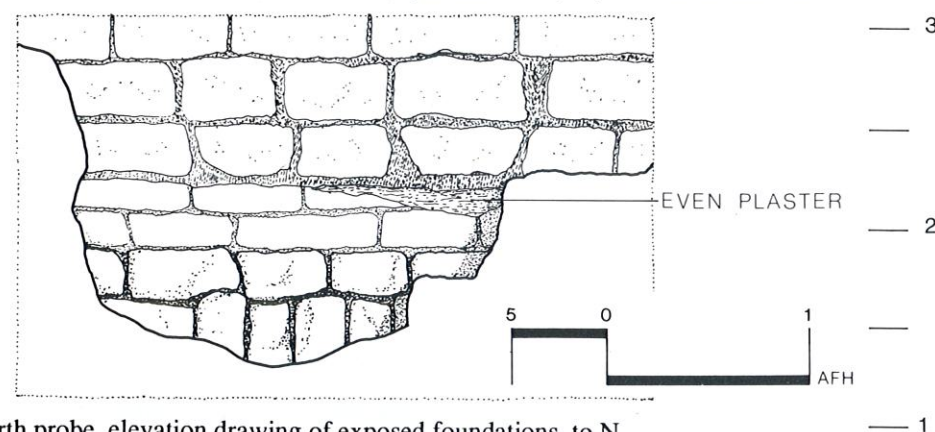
I-3b, north probe, elevation drawing of exposed foundations, to N.
